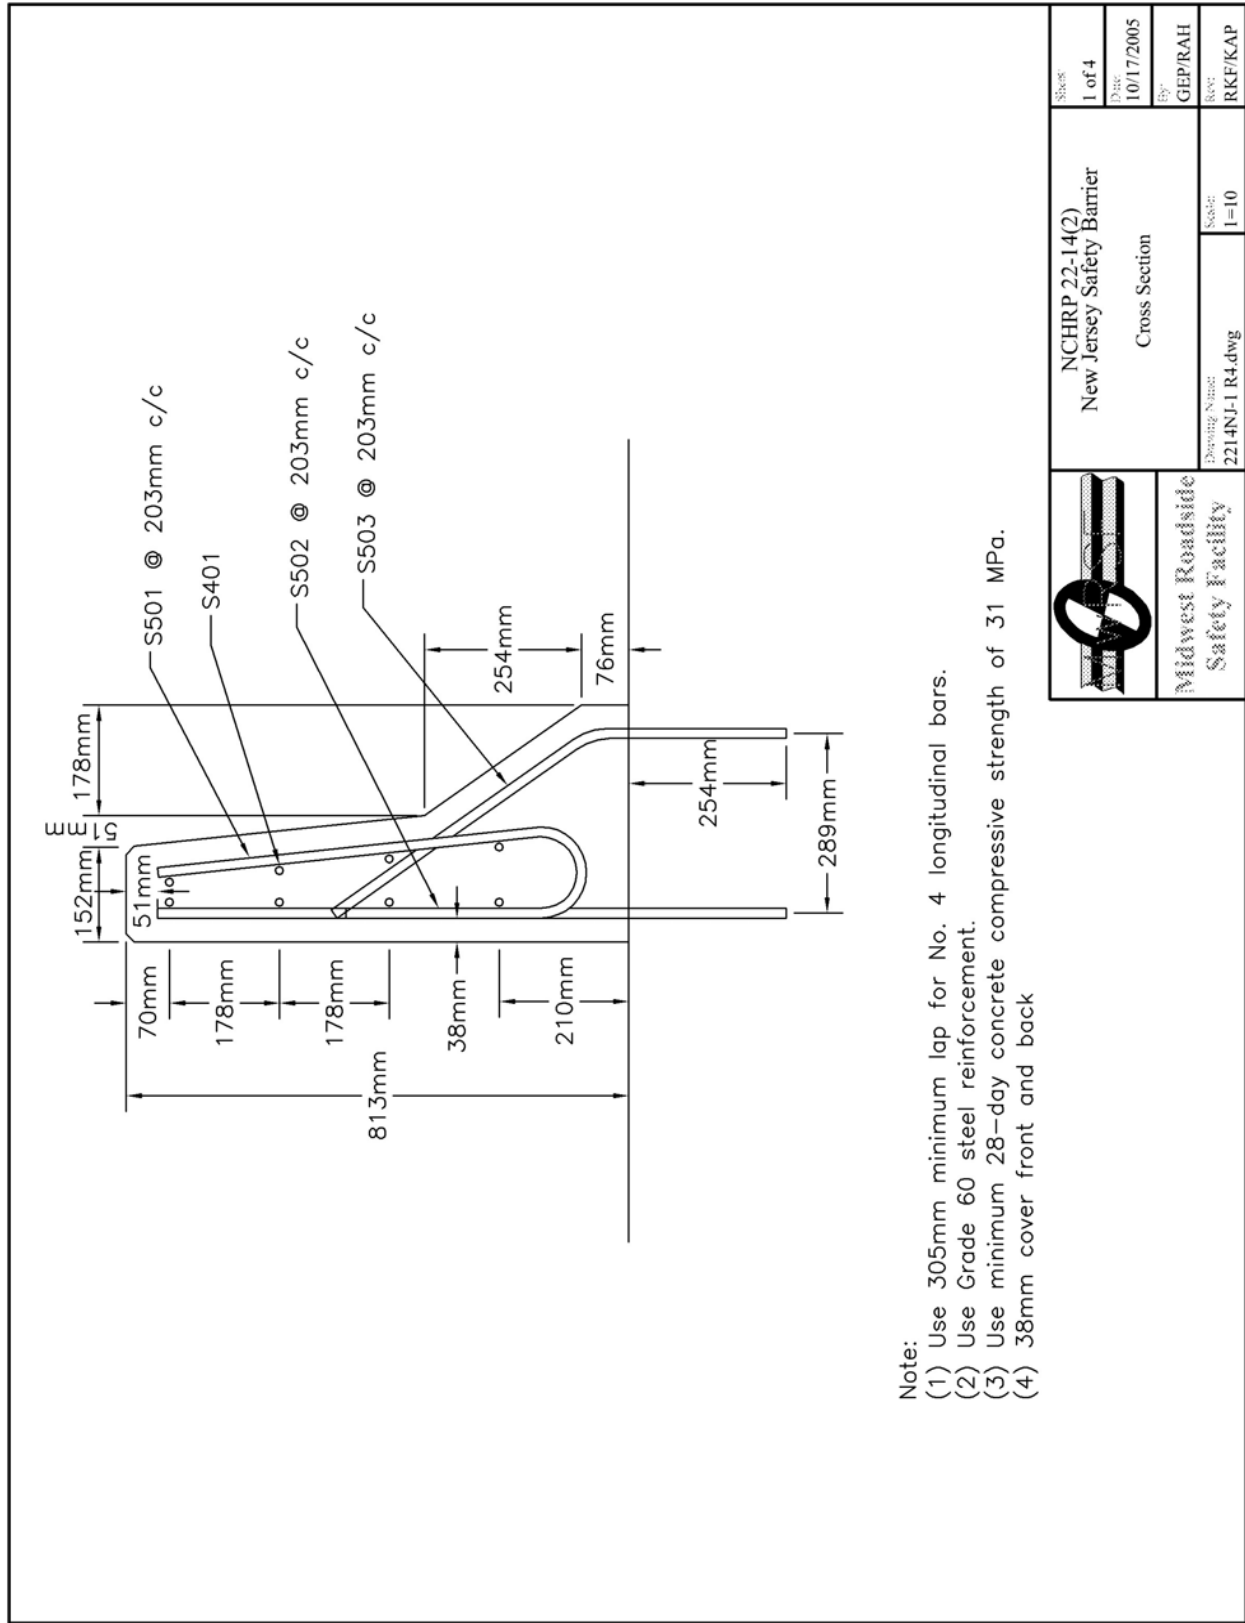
Cross Section of Permanent New Jersey Safety Shape Barrier
